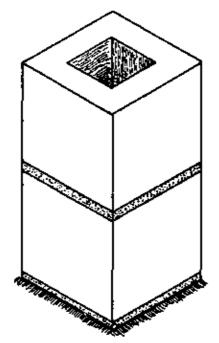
PIER BUILT WITH OPEN BLOCKS
